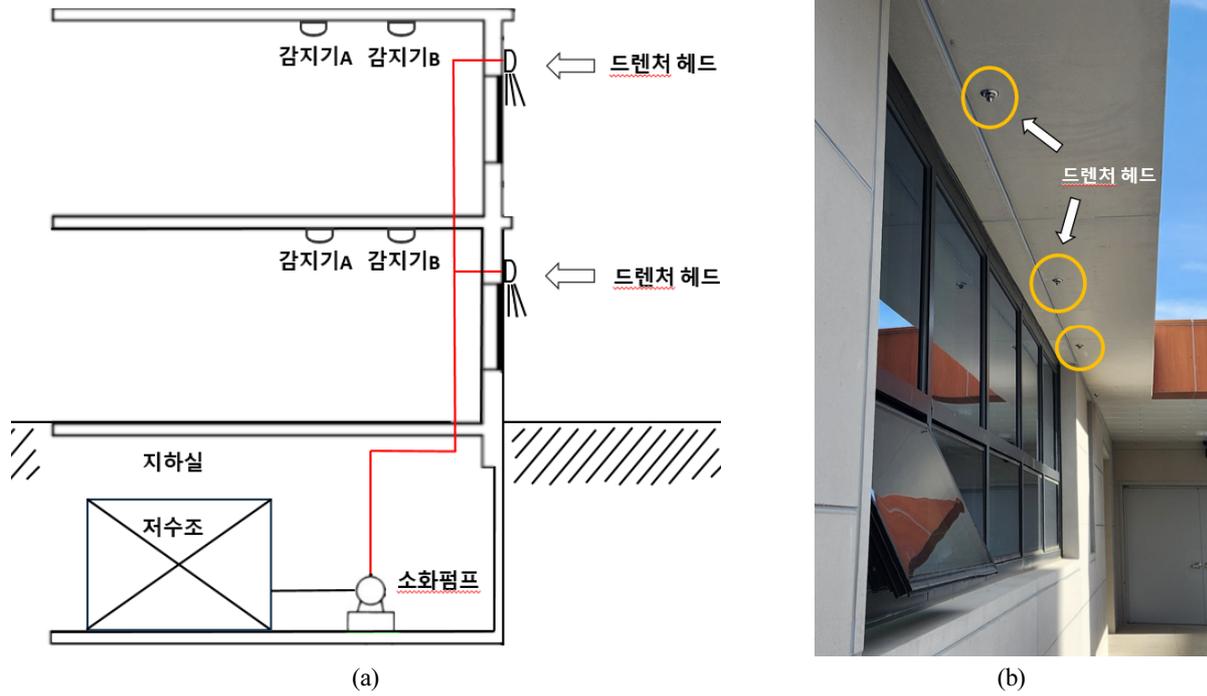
(a) Schematic drawing of drencher facility (b) Picture image of installation of drencher facility
